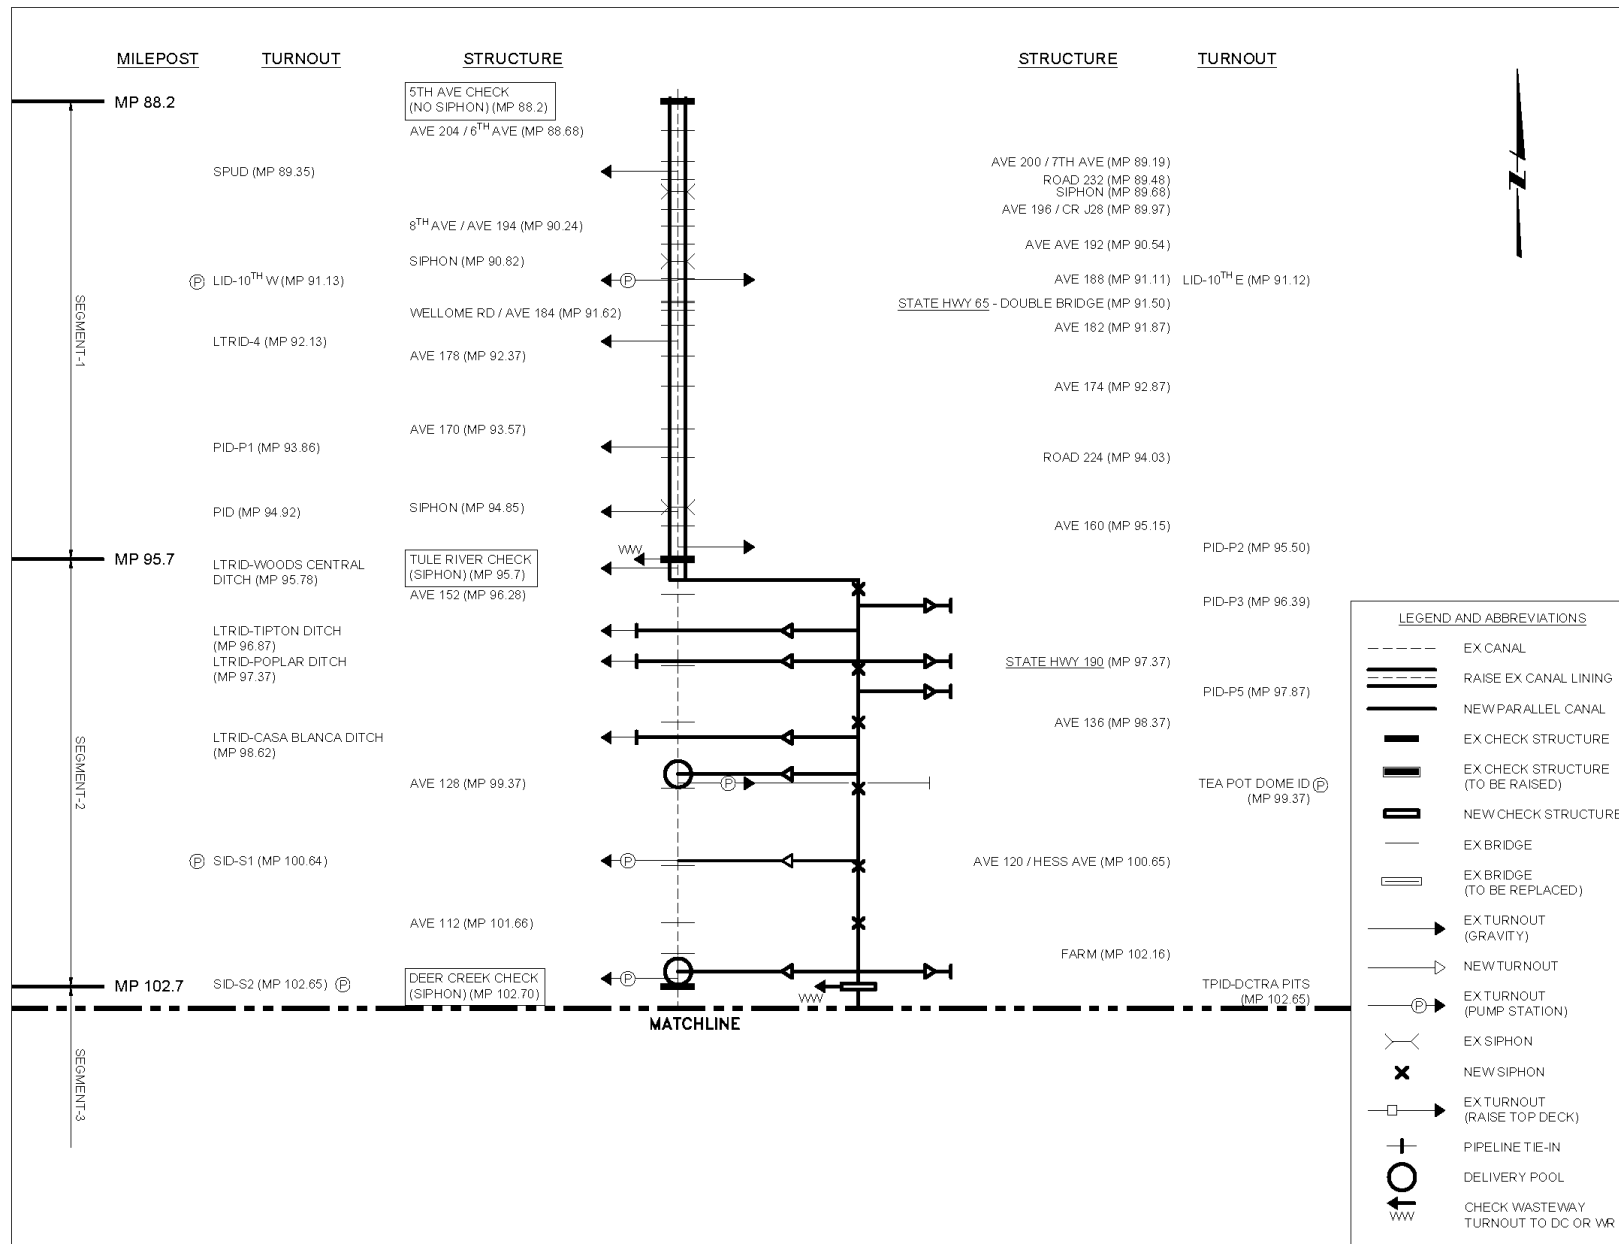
A. Recommended Plan Single-Line Diagram of Canal Segments 1 and 2
